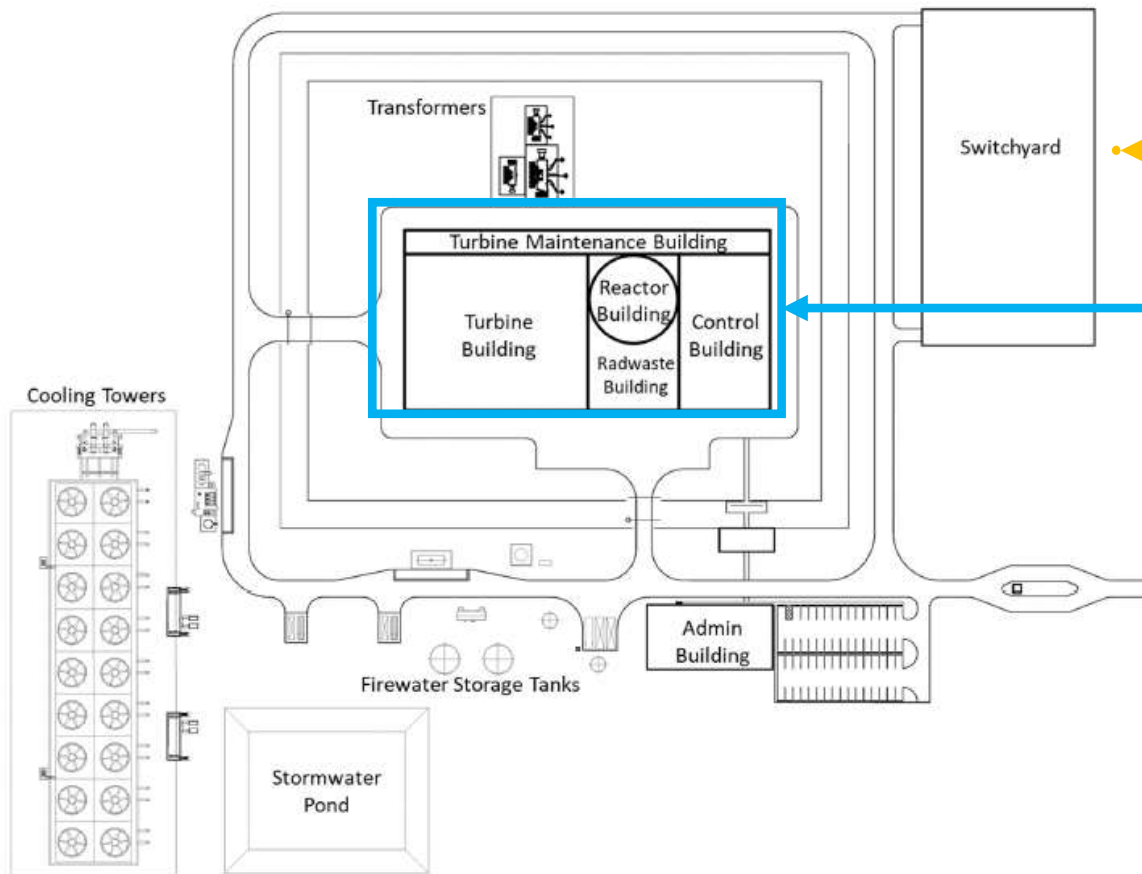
BWRX-300 Plant Layout, Site Plot Plan
